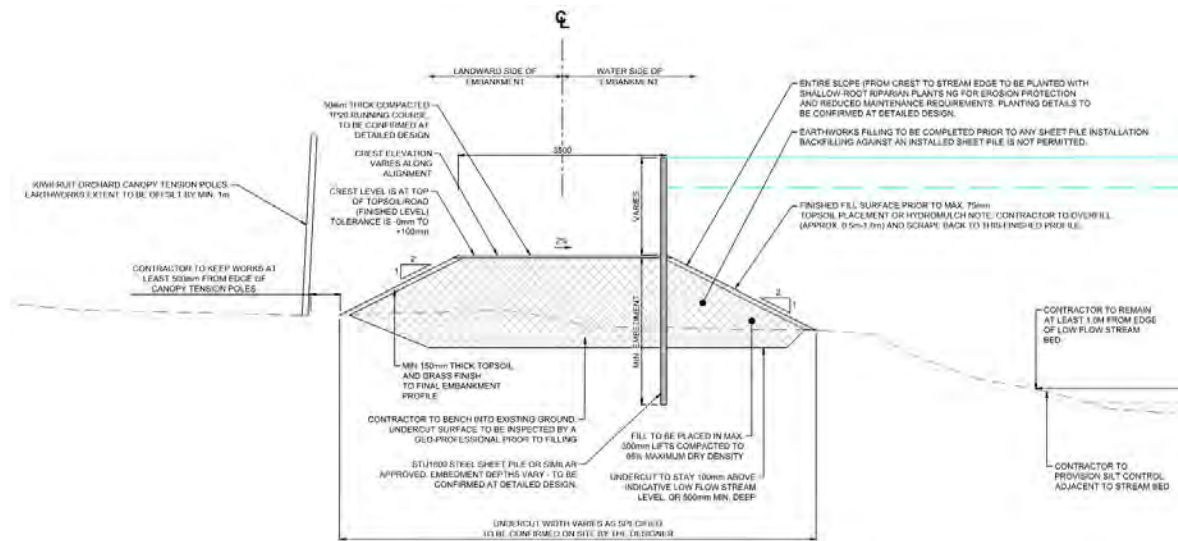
The proposed hybrid sheetpile floodwall retaining option.
